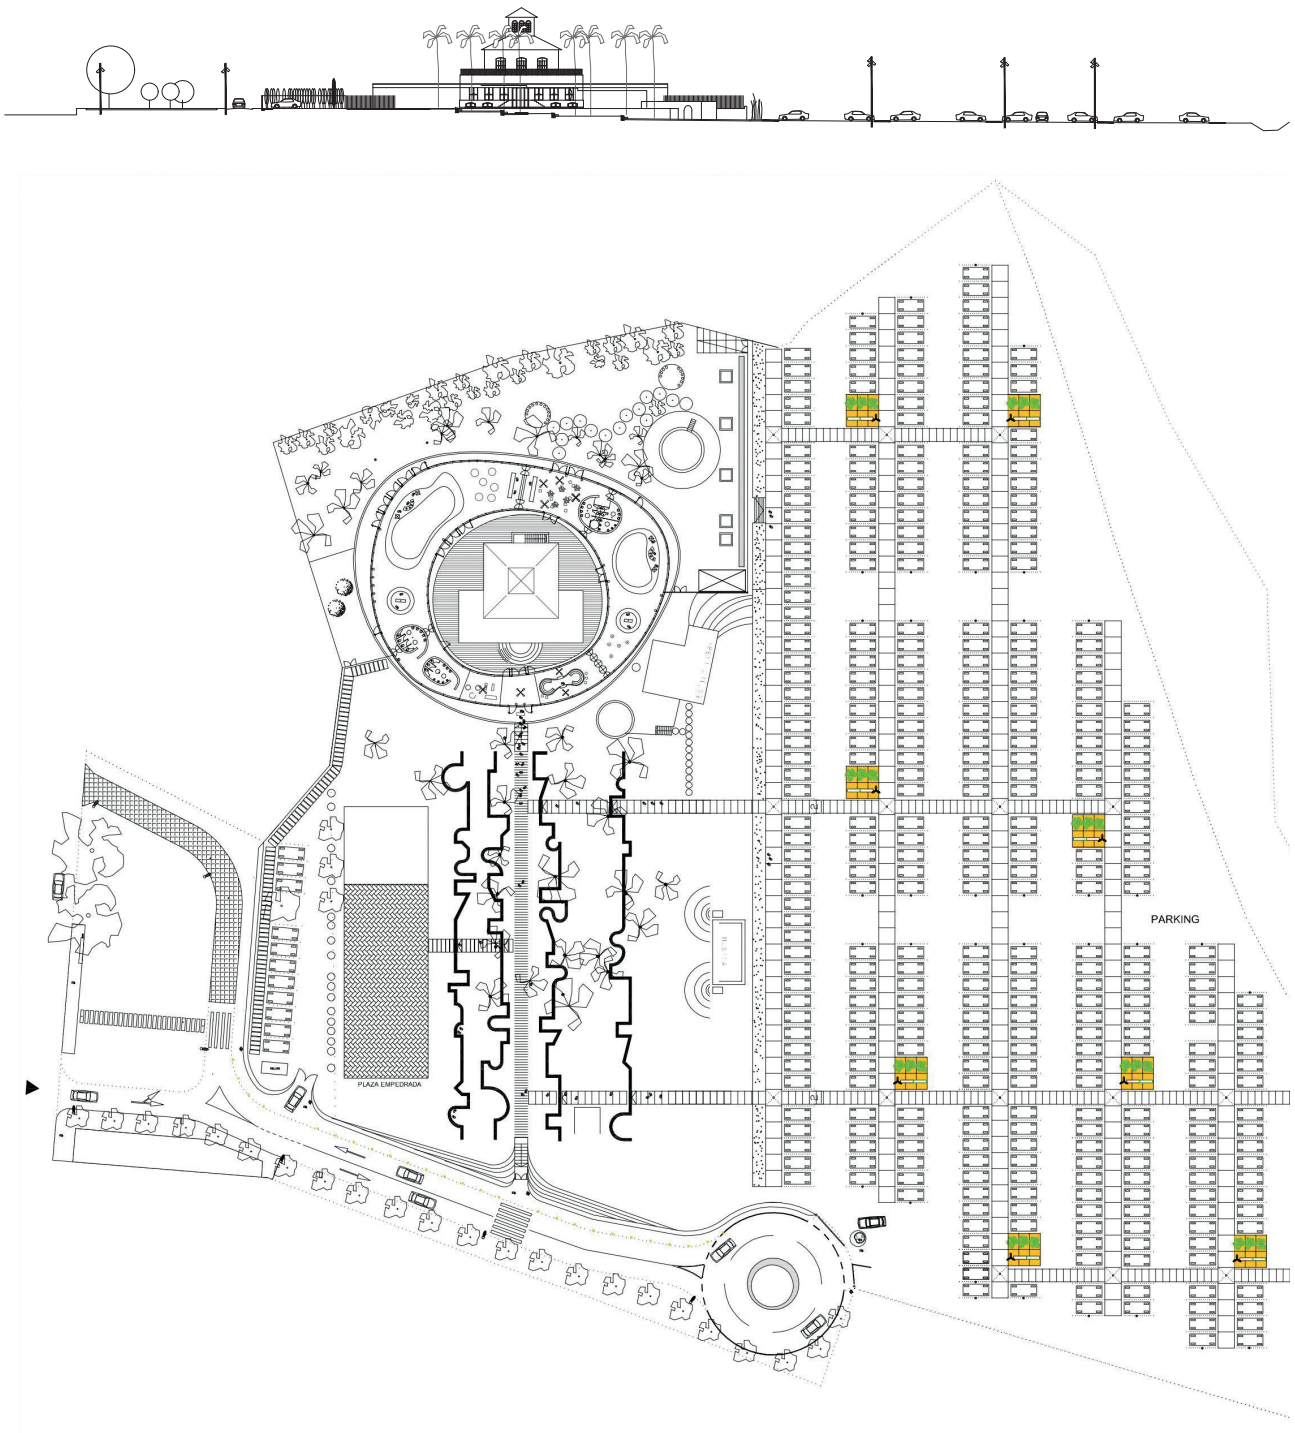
Plan and section of the Project. 2009. ©SSS Architects / Figura 2. Planta y sección del proyecto. 2009. ©SSSArquitectos.
